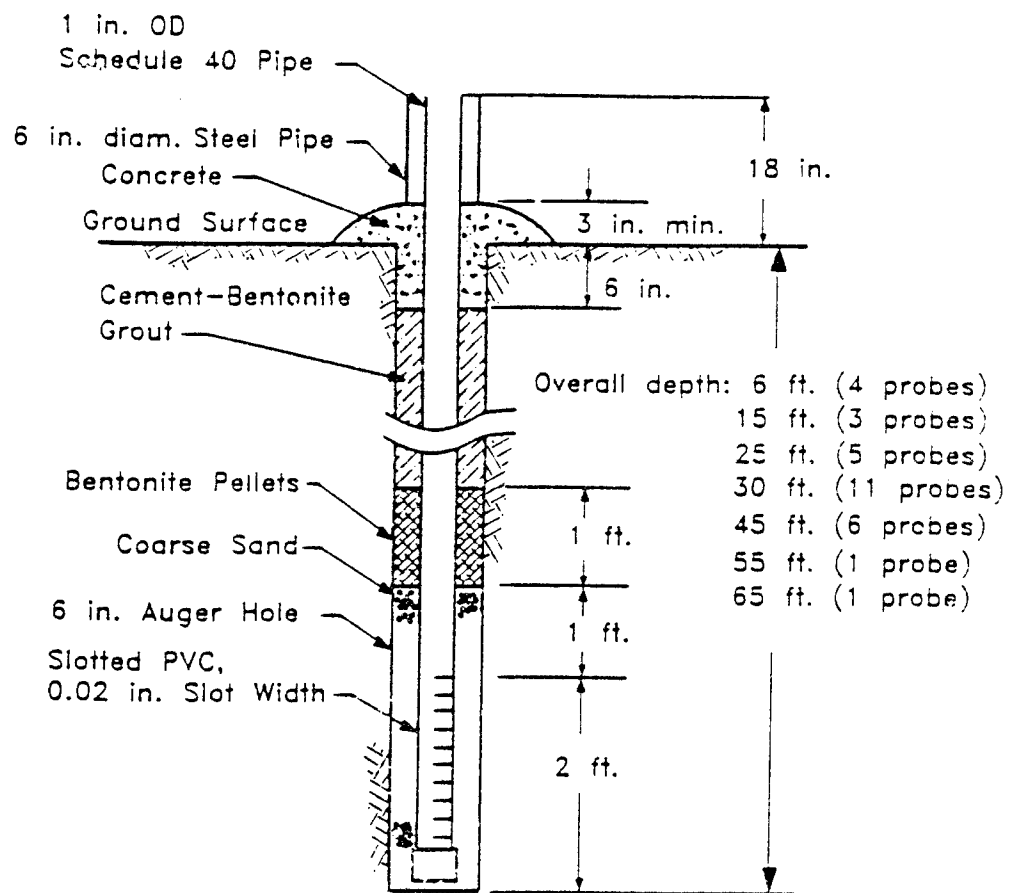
Schematic Drawing of Pressure Probe Design and Installation (3.0 meters) long.
